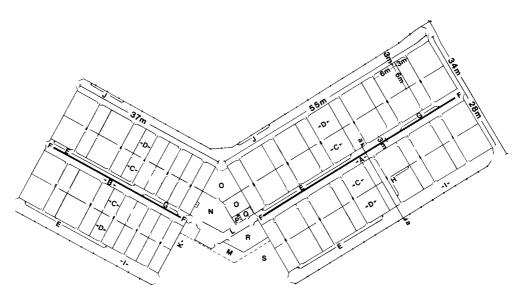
Ground plan of the Small Animal Facility at the Conservation and Research Center of the National Zoological Park. A. east wing (mammals); B. west wing (birds); C. indoor enclosures; D. outdoor enclosures; E. removable cage fronts; F. interior corridor; G. trench drain; H. 20 cm concrete masonry units; I. drive-through service area for outdoor enclosures; J. chainlink; K. loading dock; L. entrance hallway; M. porch; N. kitchen; O. storage; P. lavatory; Q. utilities; R. office; S. parking space. The section a — a showing details of an indoor and an outdoor cage arrangement is shown in Fig. 2.
